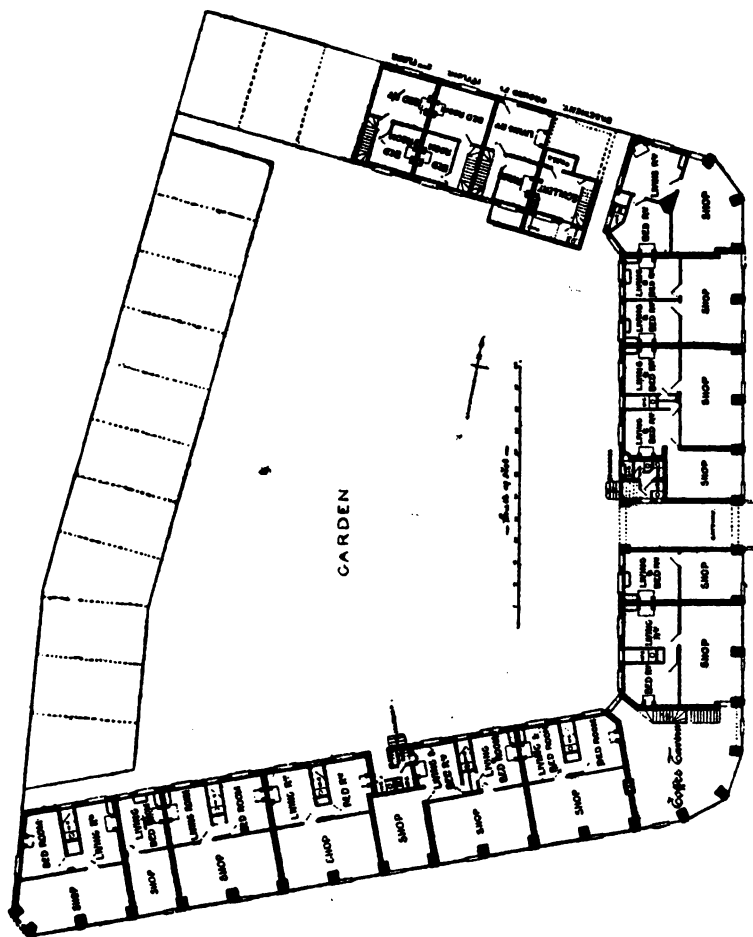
FIG. V. South London Dwellings Company Limited, Kennington Road, South Lambeth. (Ground Plan).
